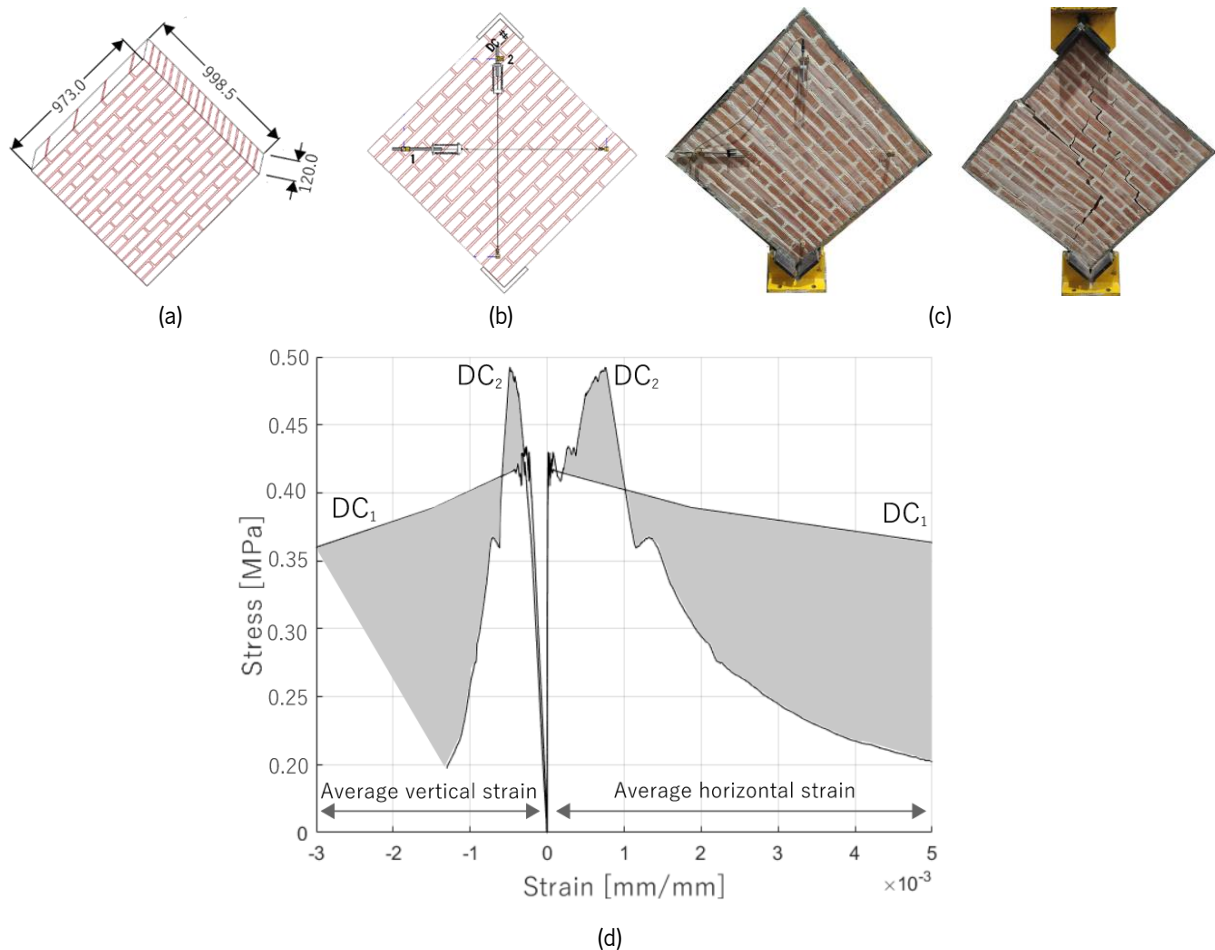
Diagonal compression tests: (a) Dimensions of DC_i in mm; (b) setup of wallets: front face; (c) undamaged and damaged wallet before and after the tests; (d) stress-strain curves.
